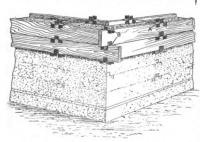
Manner of Using the Holders at the Corner of a Concrete Wall.
